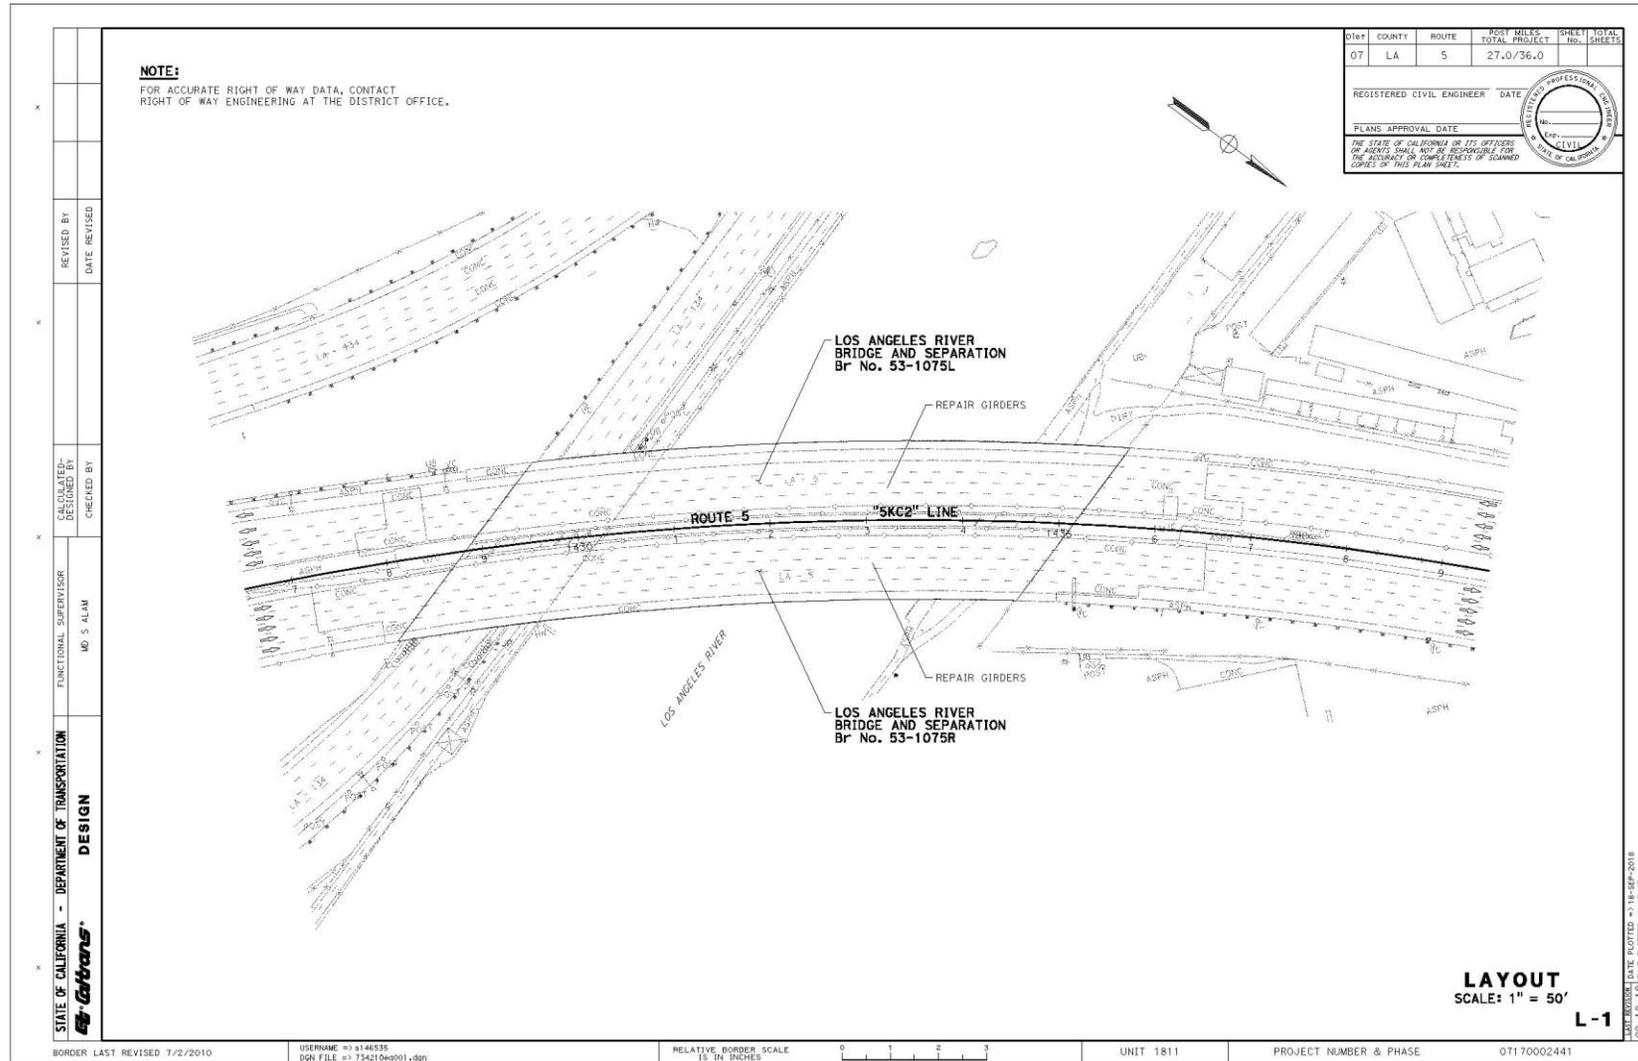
Layout L-1 Los Angeles River Bridge & Separation
